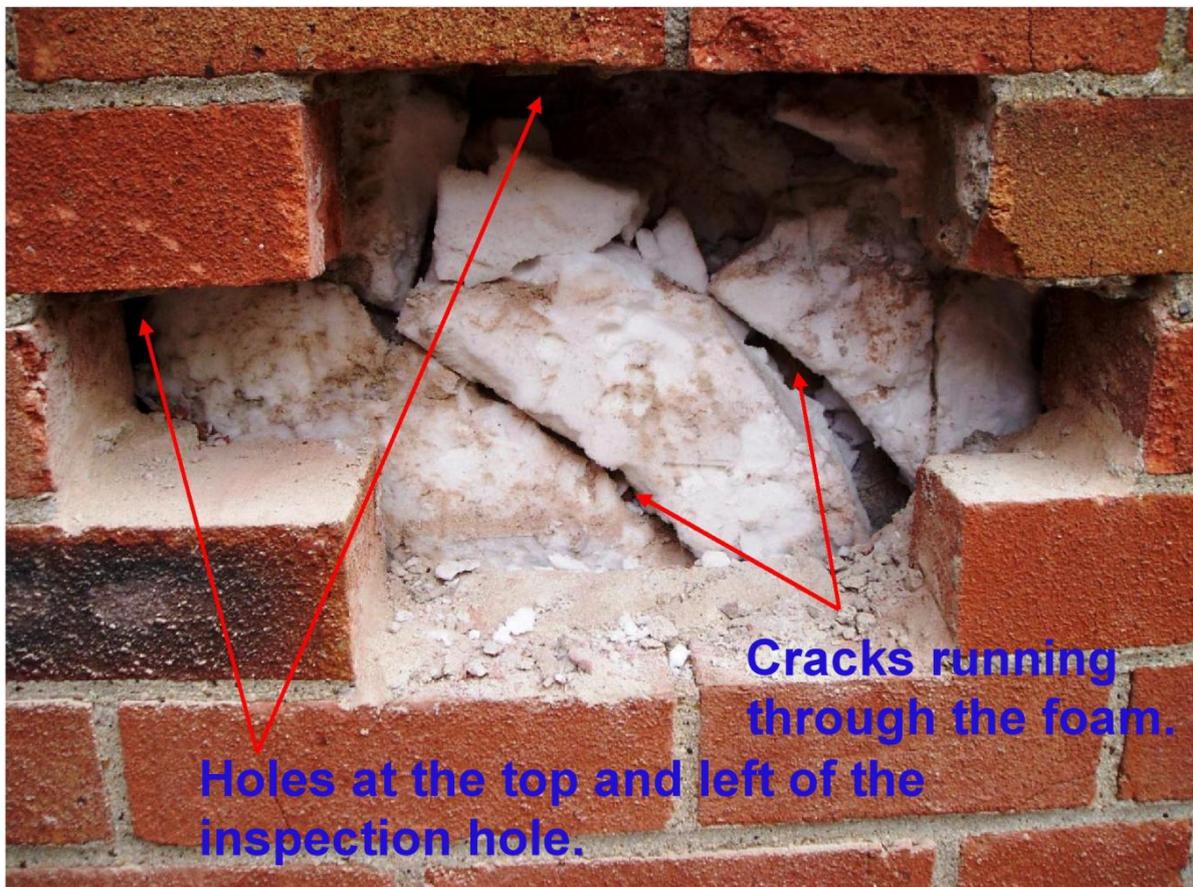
A view of the investigation hole showing cracks in the foam and holes at the top and to the left.
